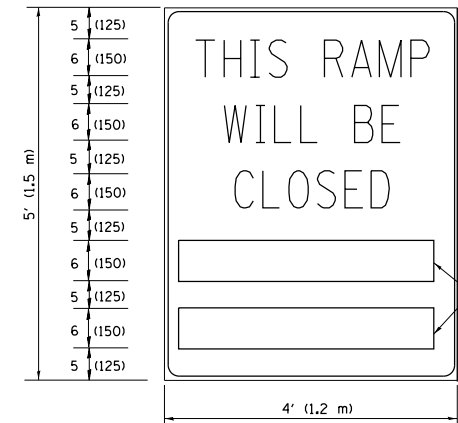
DETAIL FOR REQUIRED BARRICADES & SIGNS
